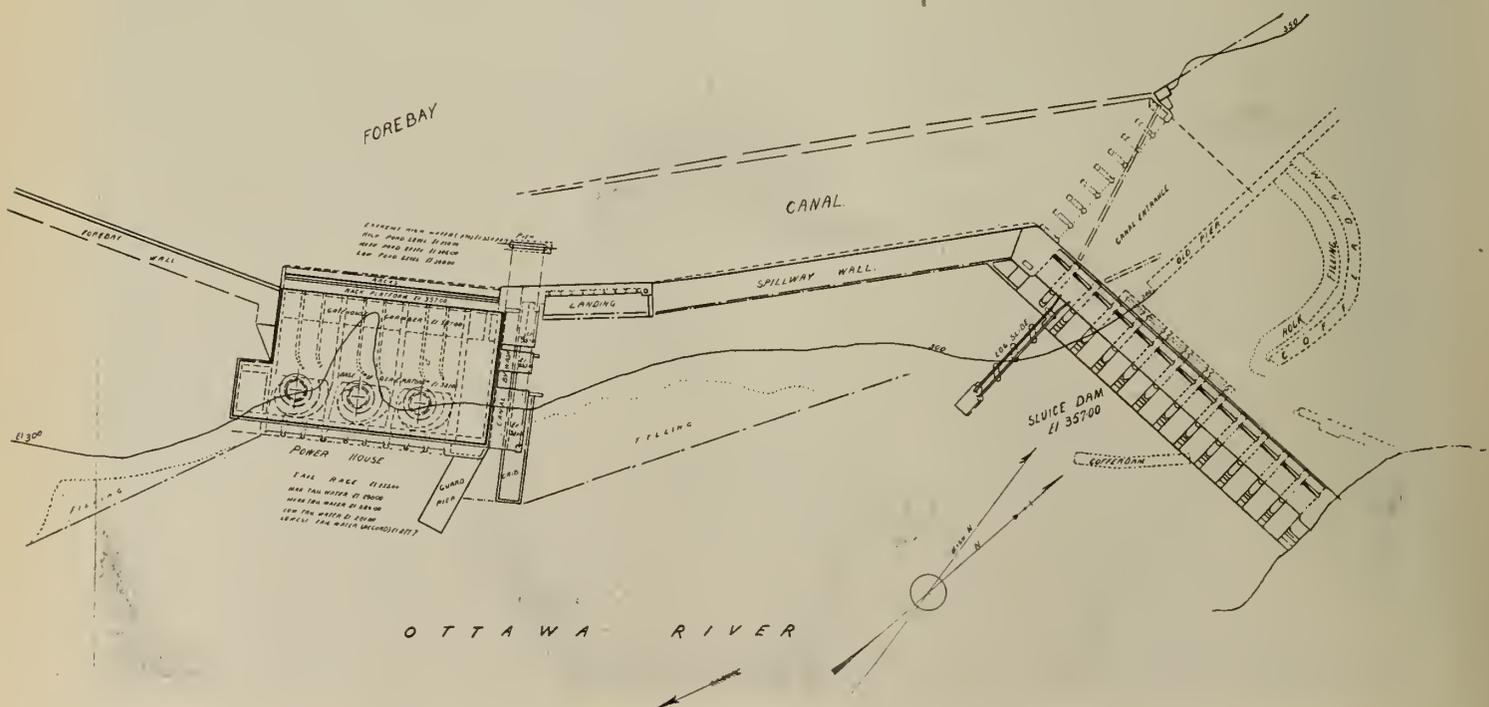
General Layout of Power Plant and Hydraulic Works.
